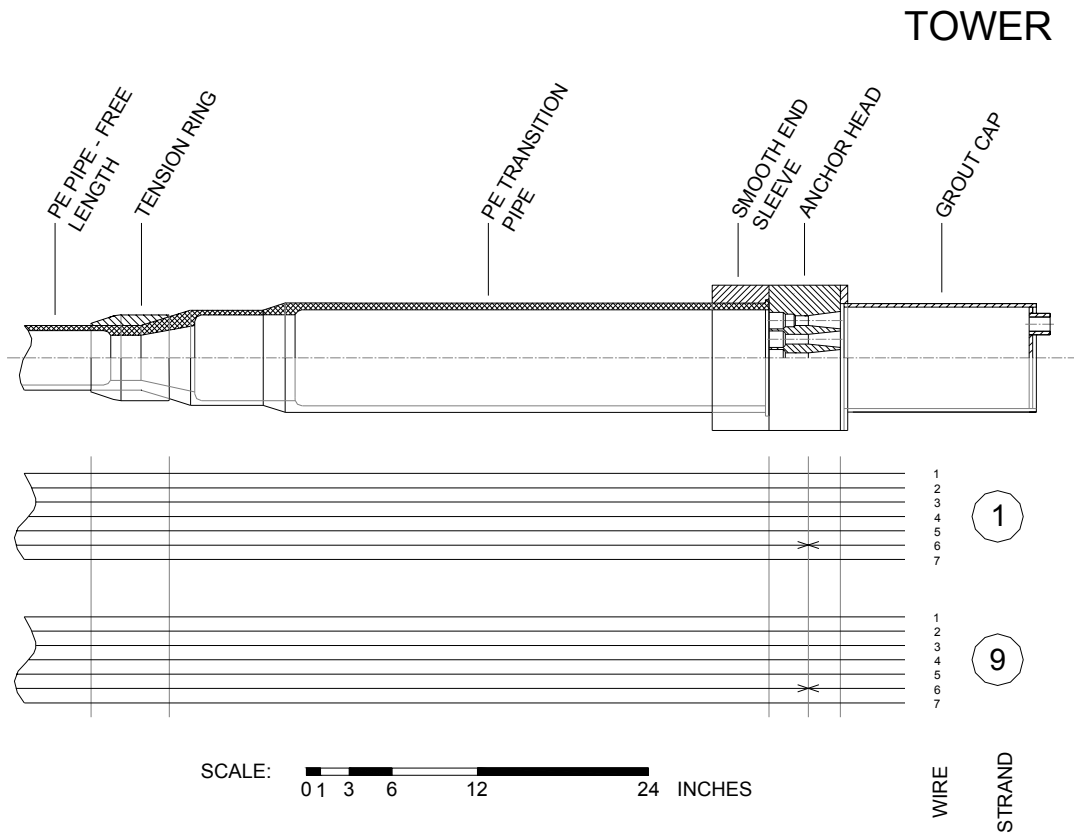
Location of wire breaks near the tower anchorage - Specimen 8
